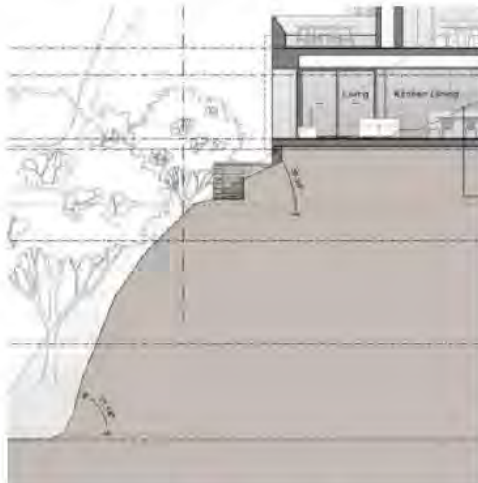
Extract of Section 4 of the Architectural Plans showing the slope of the site (Source: Tzannes)
